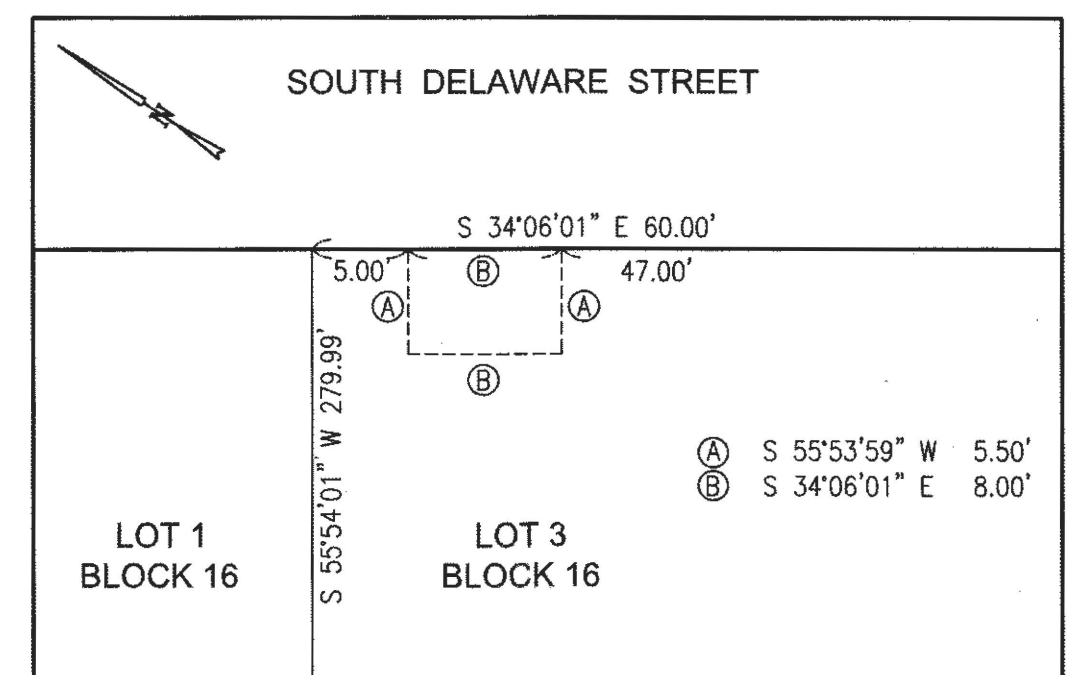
DETAIL 'E' - PUBLIC ACCESS EASEMENT (P.A.E.)
